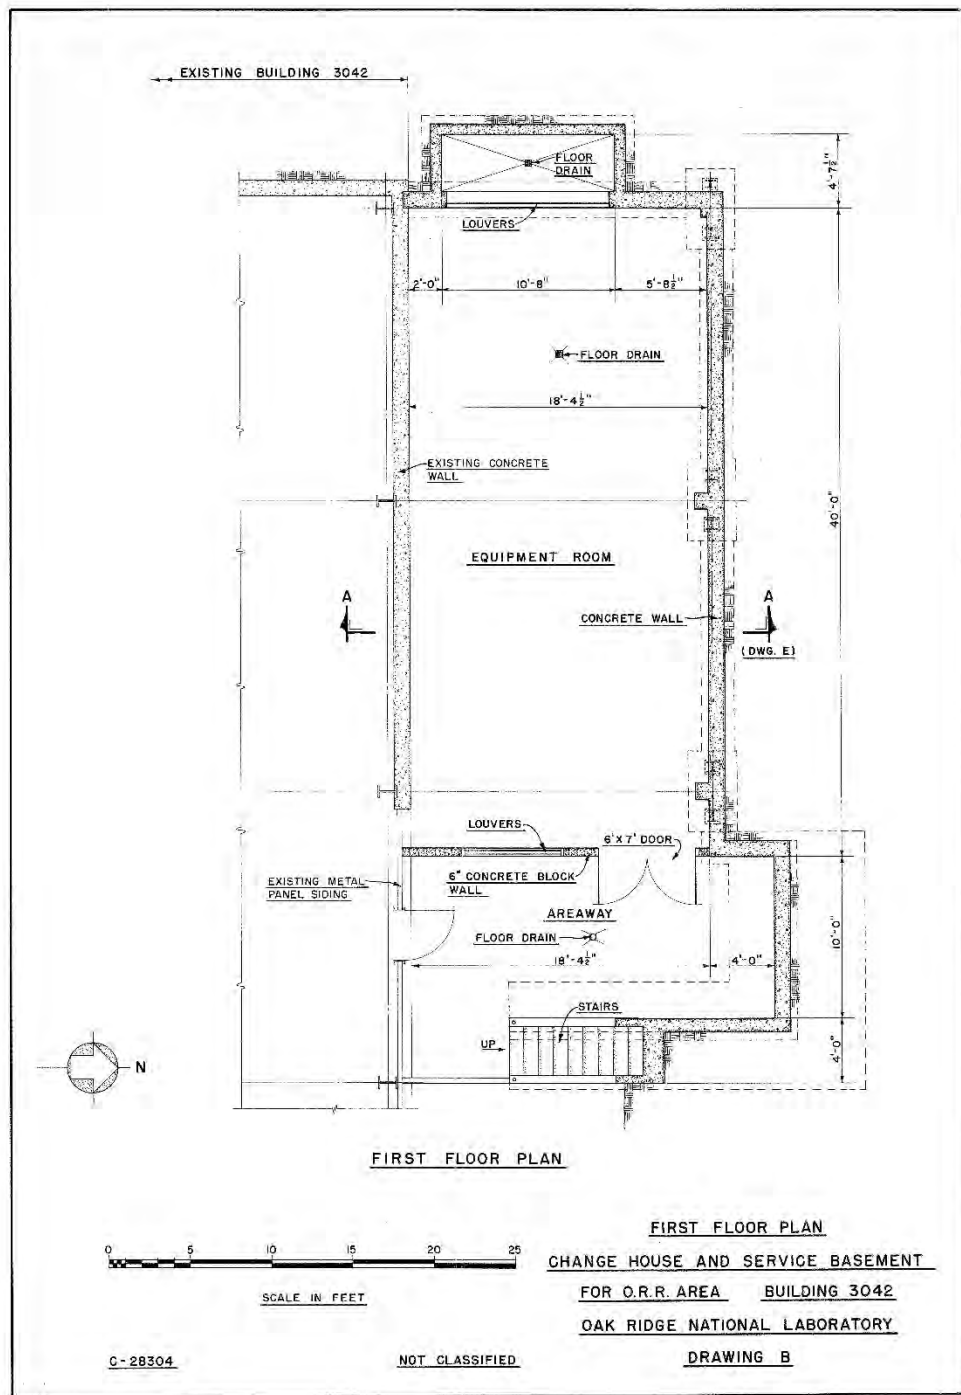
First floor plan for the circa 1957 Change House and Service Basement addition to the north elevation of Building 3042 (Oak Ridge National Laboratory, n.d.).
